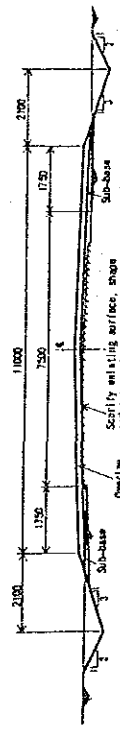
ROAD IMPROVEMENT PLAN OPTION 2
